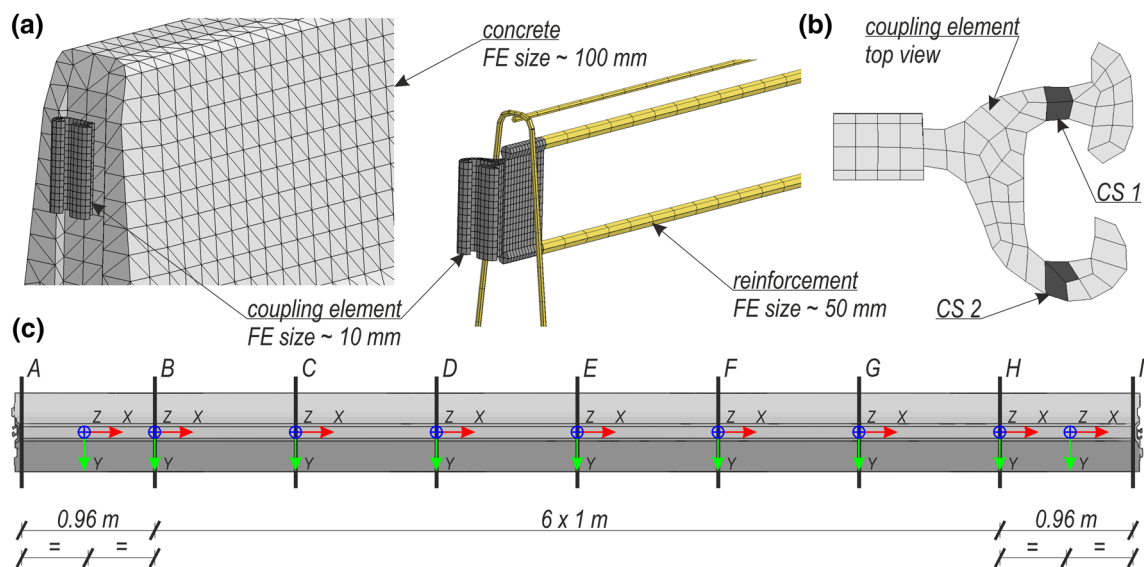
Concrete segment description: a segment mesh details, b top view of a coupling element, and c cross-section locations
